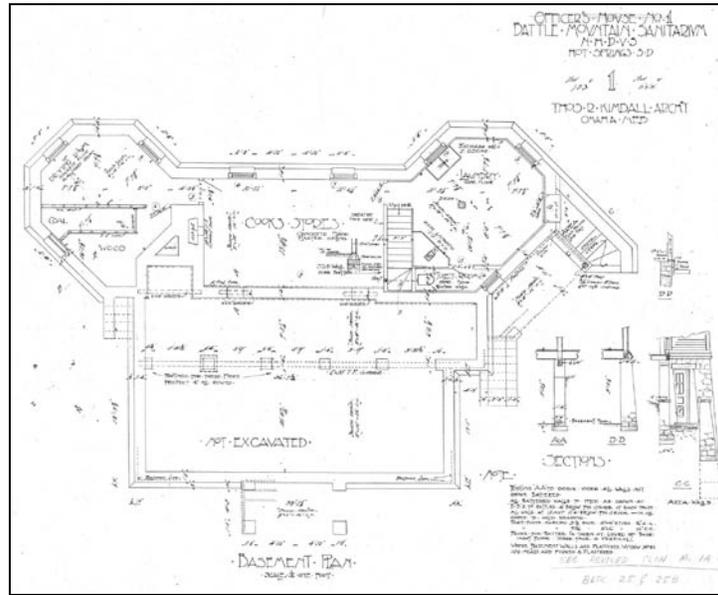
Thomas Rogers Kimball, Basement Floor Plan, "Officer's House No. 1," (November 1905)
